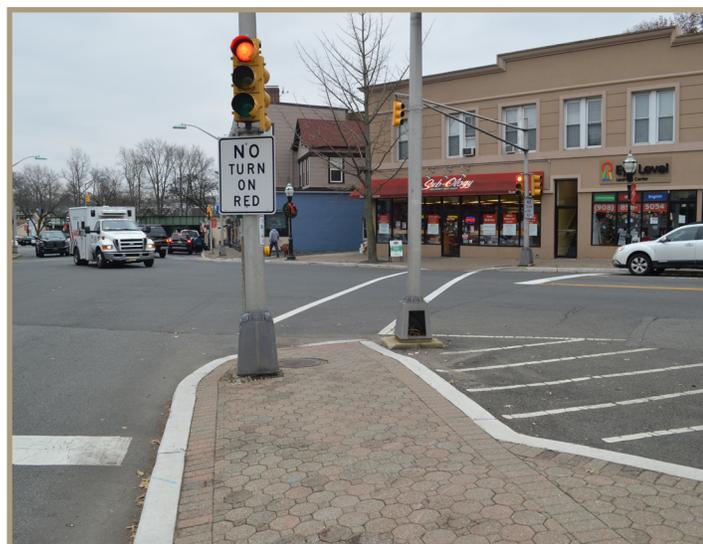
Crosswalk on southeast corner of plaza is not ADA-compliant and lacks pedestrian signals (looking south).
